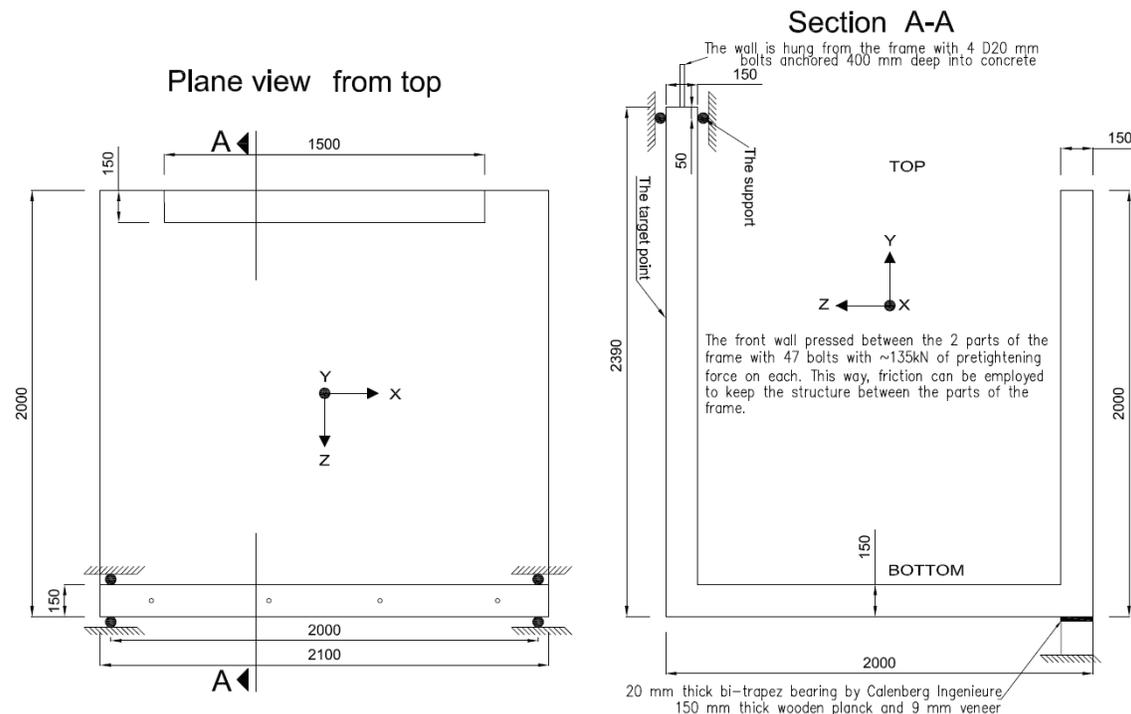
Left: The tested structure when viewed from top. Right: Section A-A of the structure.
